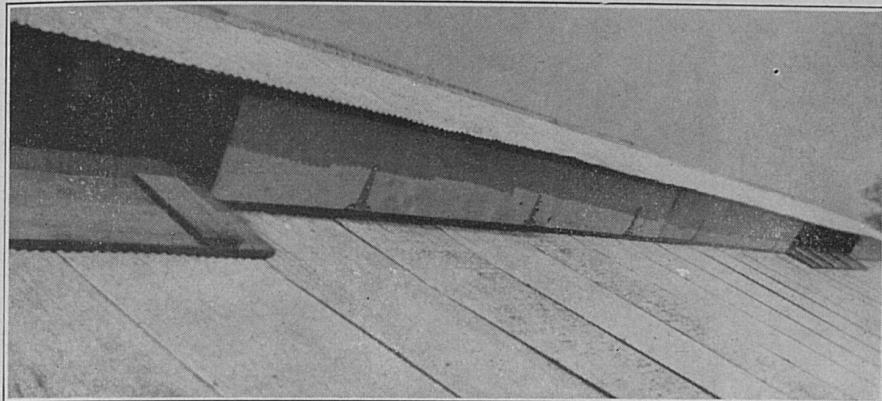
Ridge ventilator partly open. (Plan No. 1.)
